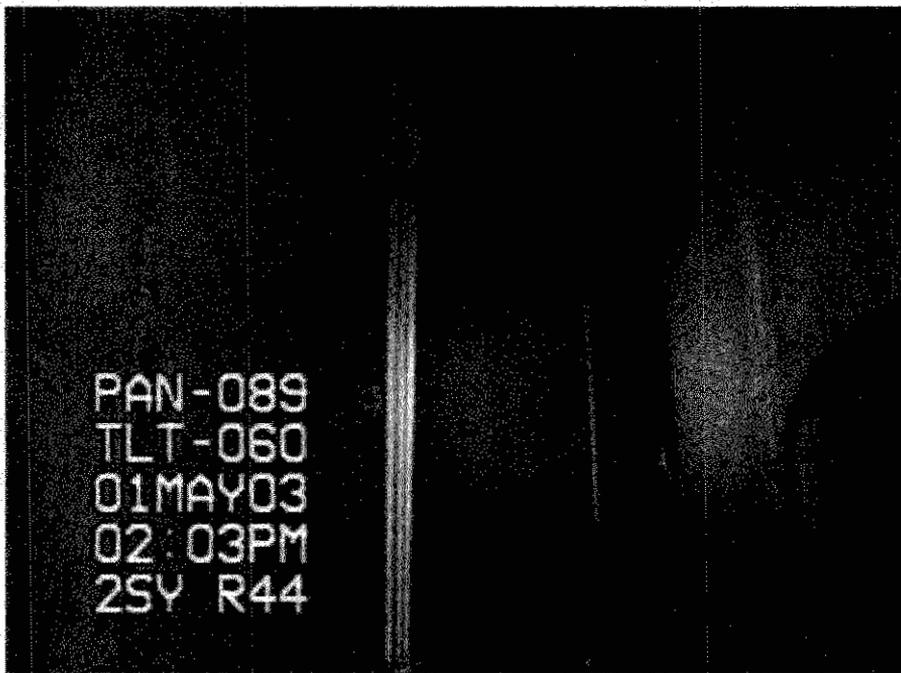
SY-102 Riser 44, Secondary Tank Wall (Left, 2003)
